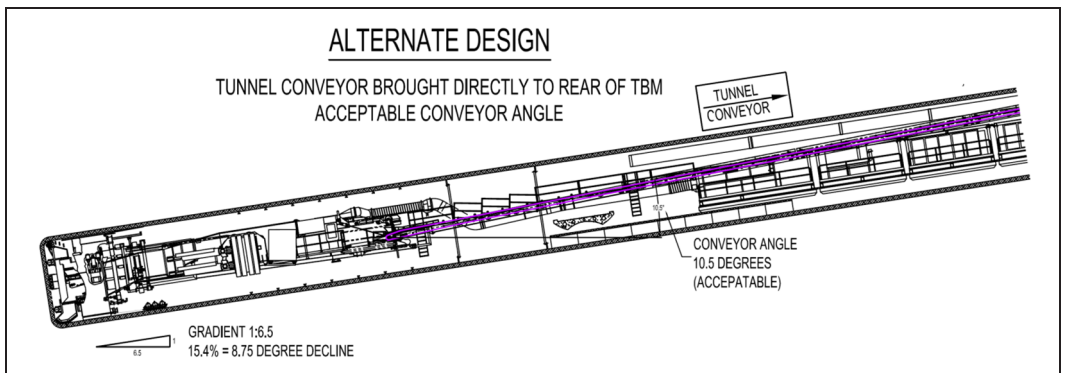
Alternate conveyor design brings tunnel conveyor directly to the rear of the TBM
